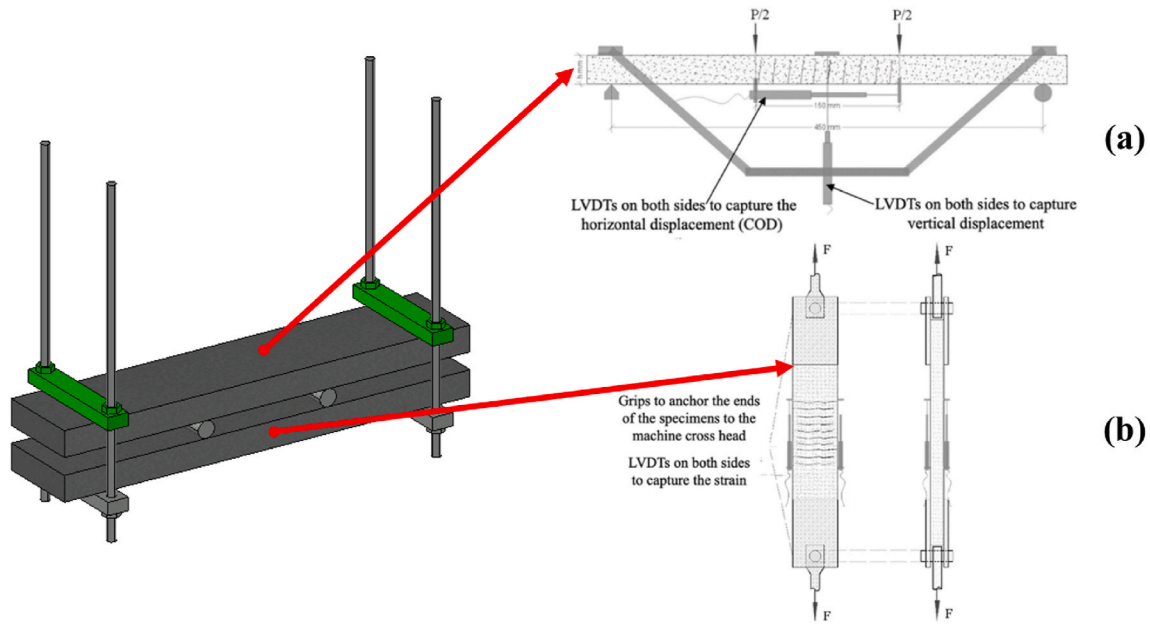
Destructive tests layout; (a) 4-point bending, and (b) direct tension.
